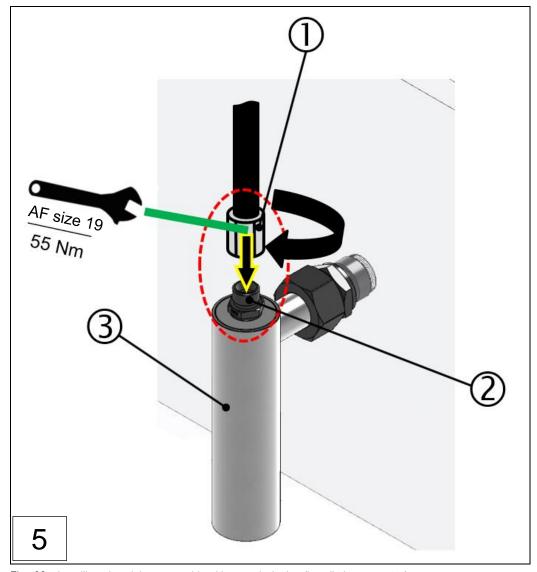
Installing pipe siphon assembly with commissioning (installation steps 1-5)
